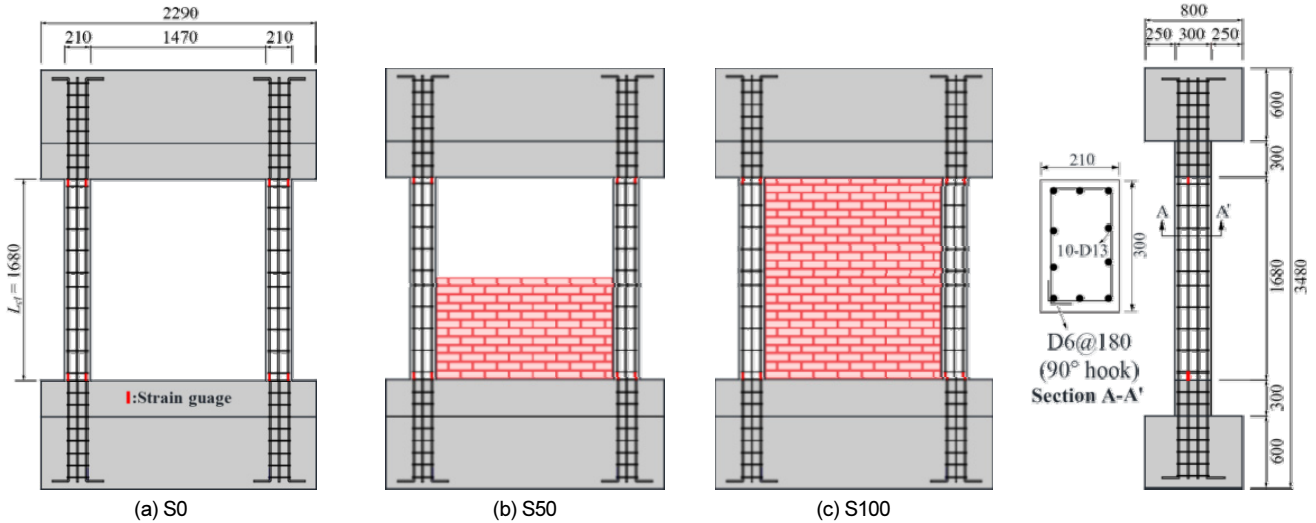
Dimension and reinforcement details of test specimens (unit: mm)
